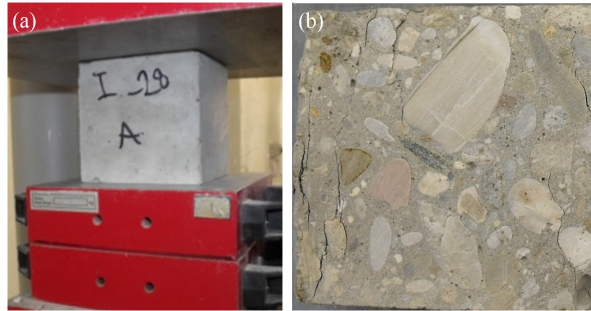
(a) Compression test on cubic samples cut from the fractured specimens and (b) the shape after destruction
